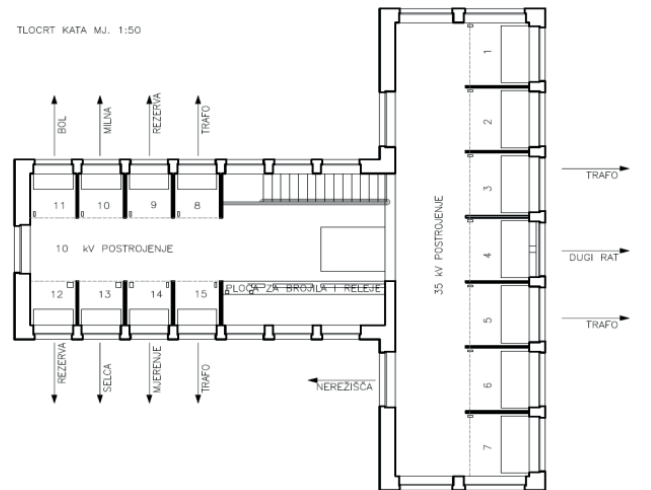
The layout of the plant (the first floor's plan) before reconstruction
